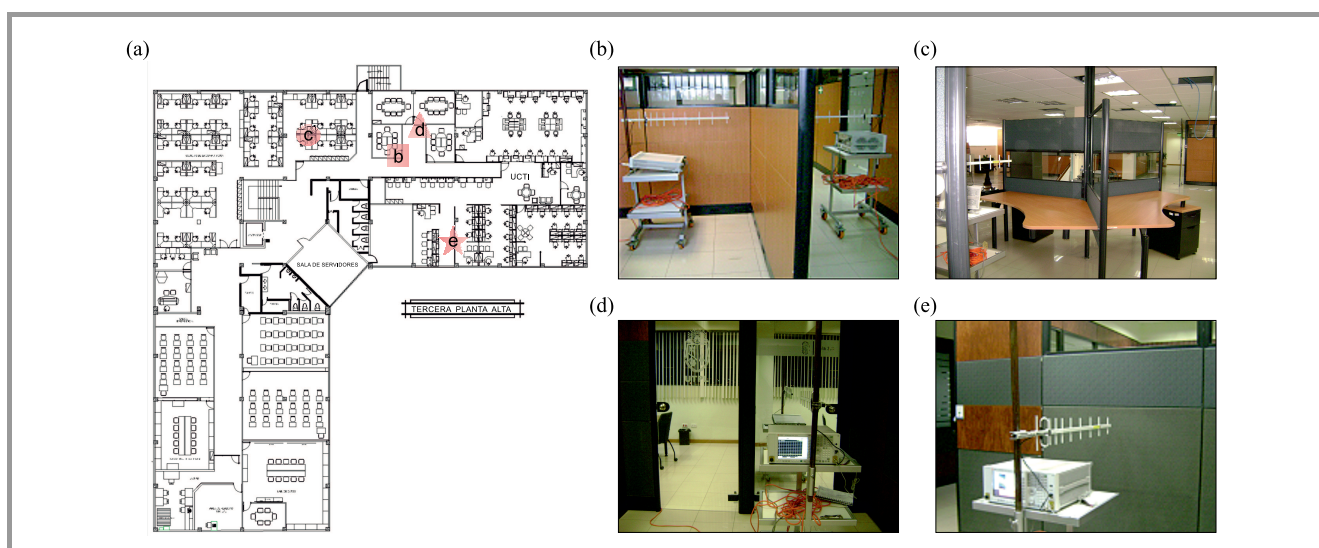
NLOS type building: (a) architectural plan, (b) gypsum walls, (c) wood with glass and metal intersecting cubicles, (d) glass doors, and (e) wooden walls covered with textile and glass.
